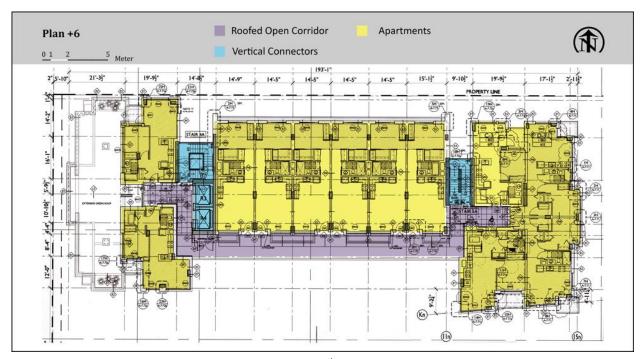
6th Floor Plan The arrangement of the open corridor and other areas
